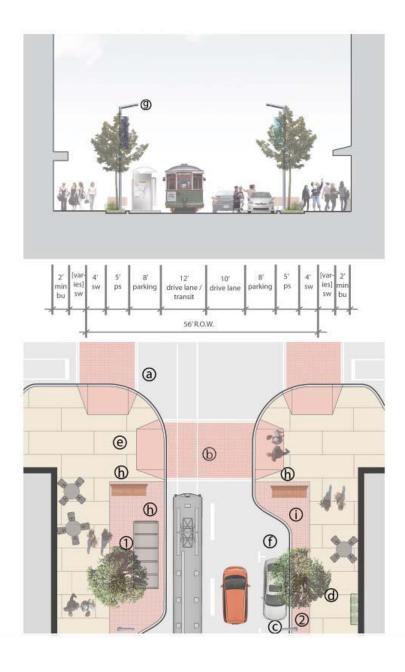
F (Page 2 of 8) <u>Streetscape Standards</u>
